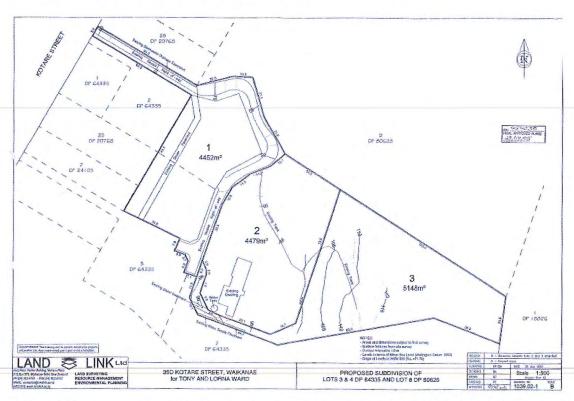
Approved subdivision plan showing the current layout and existing pattern of easements.
